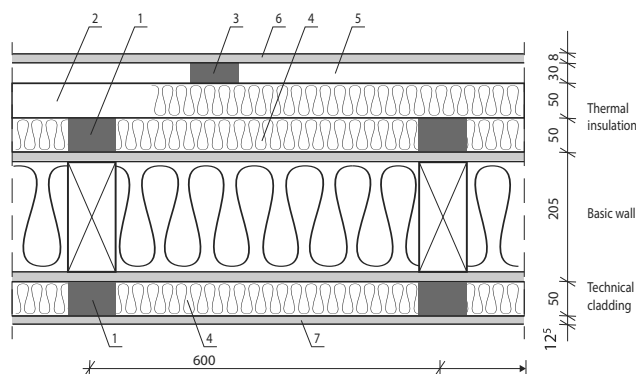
Sample no. 2, façade with thermal insulation with a venting cavity: 1) studs; 2) horizontal battens; 3) vertical grid; 4) mineral wool 50 mm; 5) ventilating cavity 30 mm; 6) fibre-cement board 8 mm; 7) plasterboard 12.5 mm.
